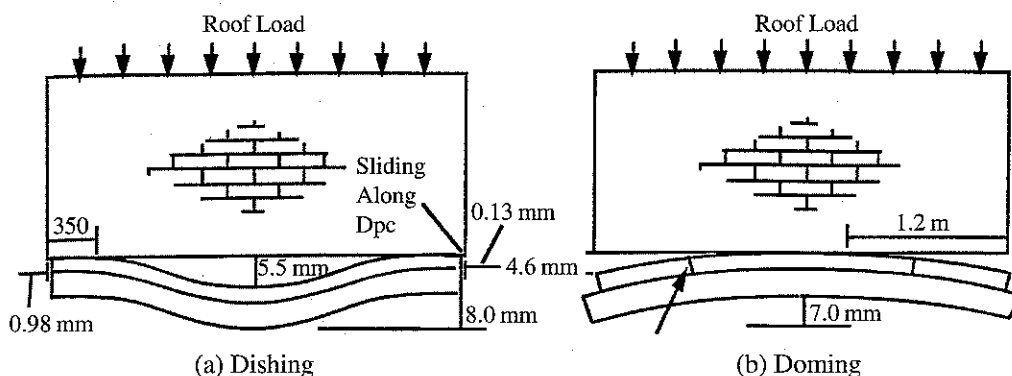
Experimental behaviour of masonry walls under foundation movements (Bryant 1993)
